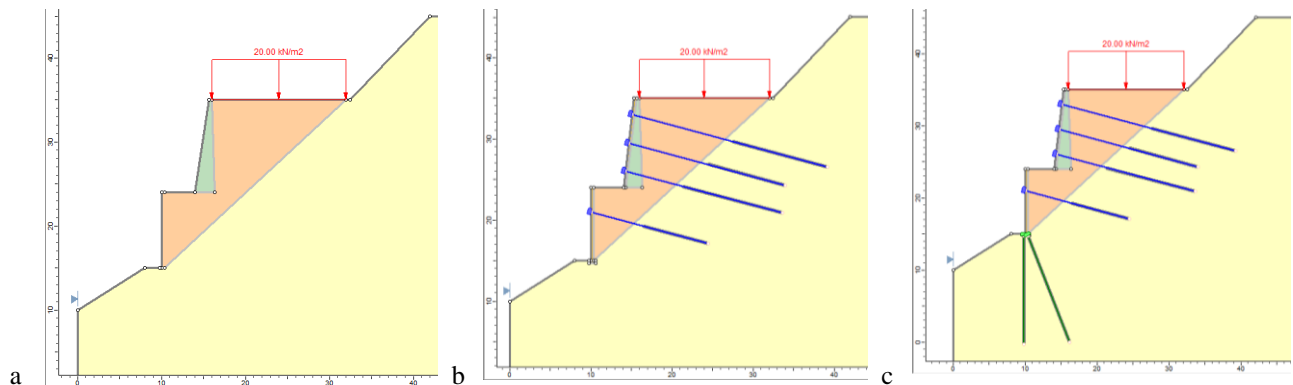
(a)Model 1: Existing Slope with Retaining Wall (b) Model 2: Existing Slope with retaining wall and ground anchors (c) Model 3: Existing Slope with retaining wall, ground anchors and micropiles
